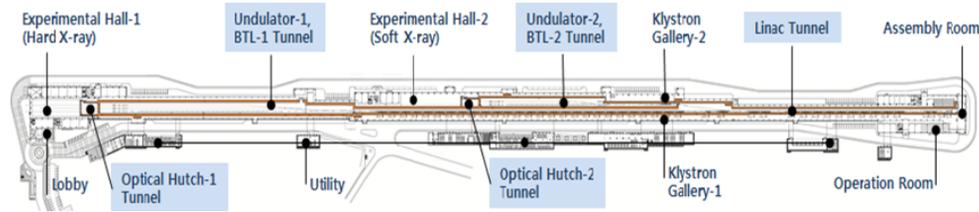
Layout of the PAL-XFEL buildings. The beam direction is from the right to the left.
